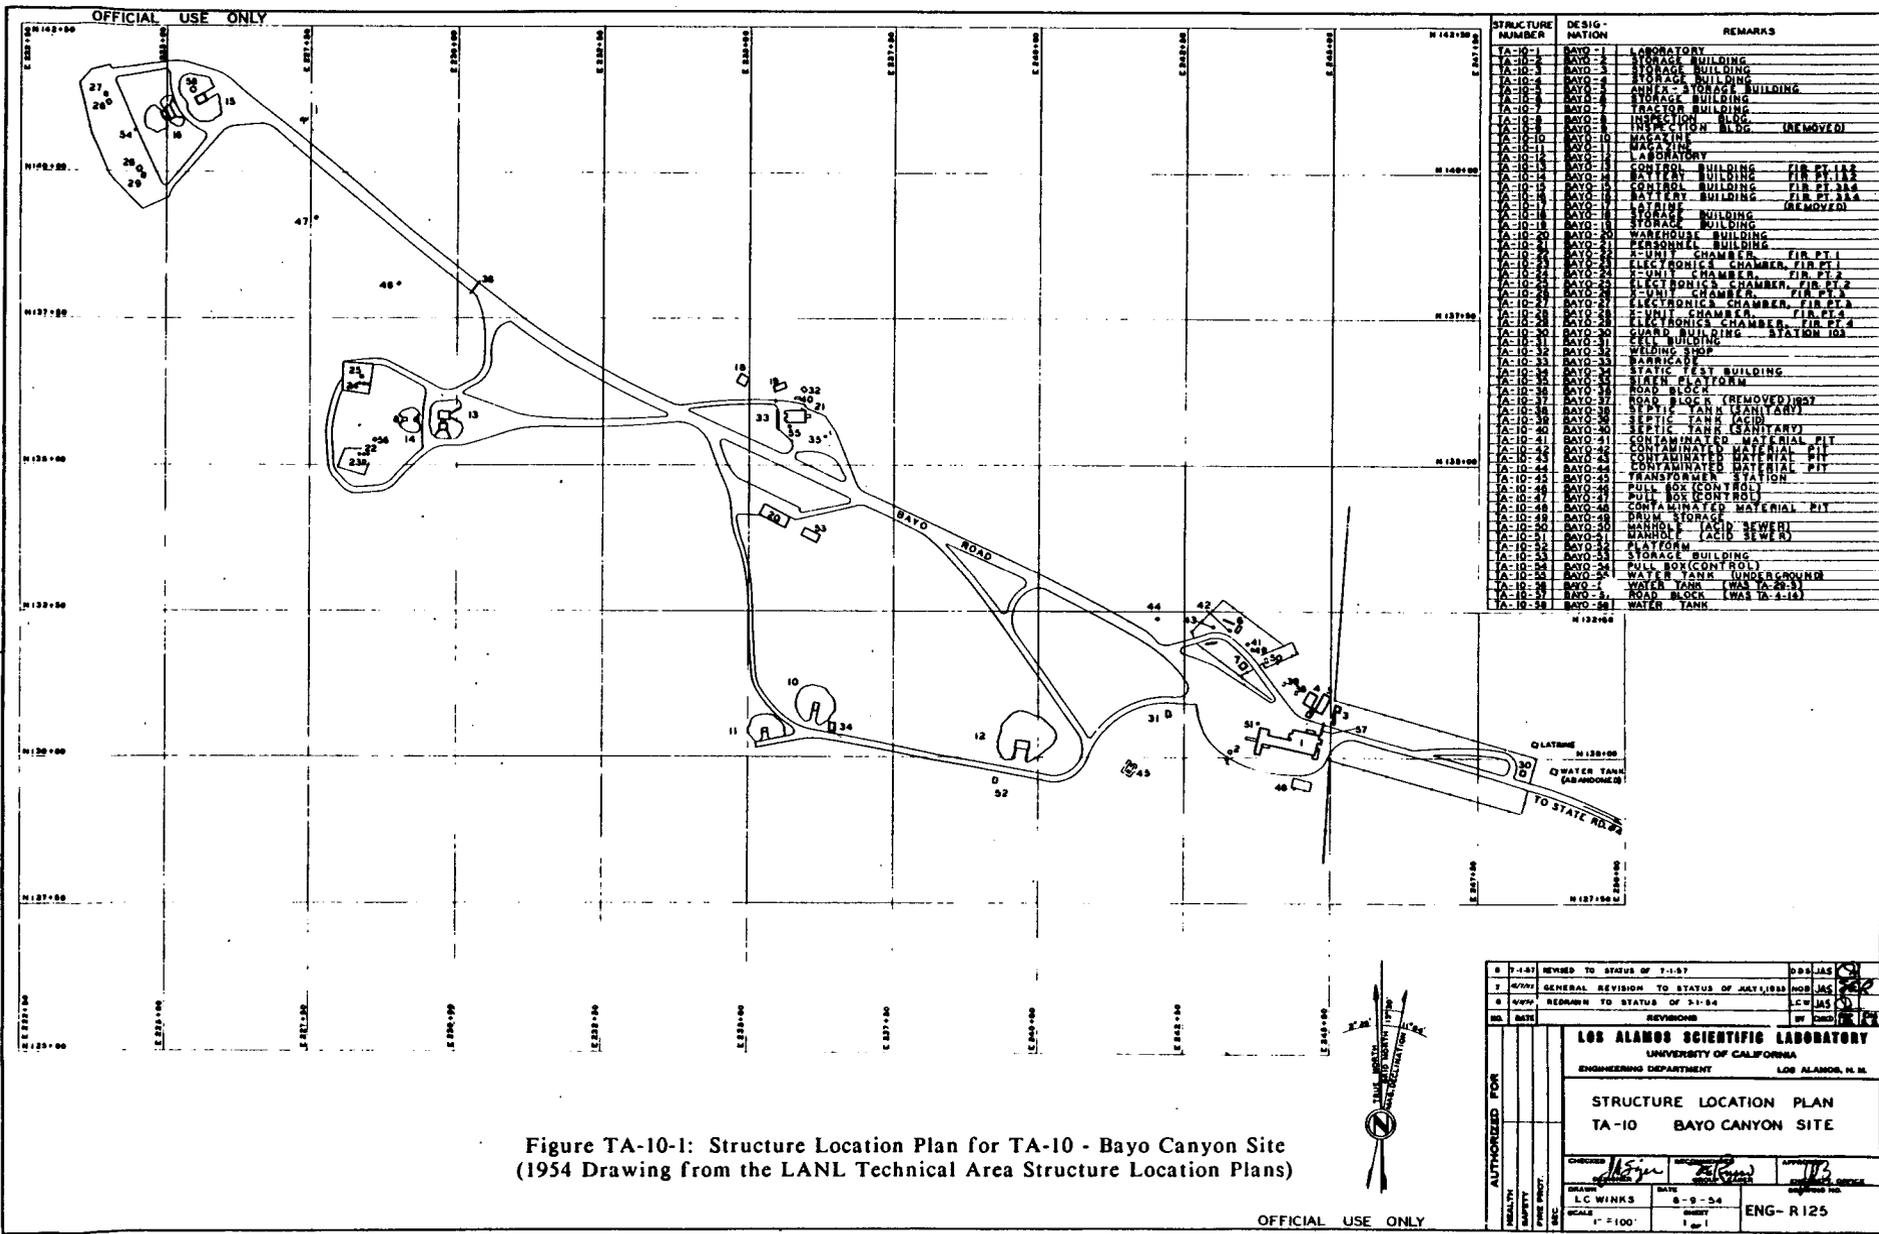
Structure Location Plan for TA-10 - Bayo Canyon Site (1954 Drawing from the LANL Technical Area Structure Location Plans)
